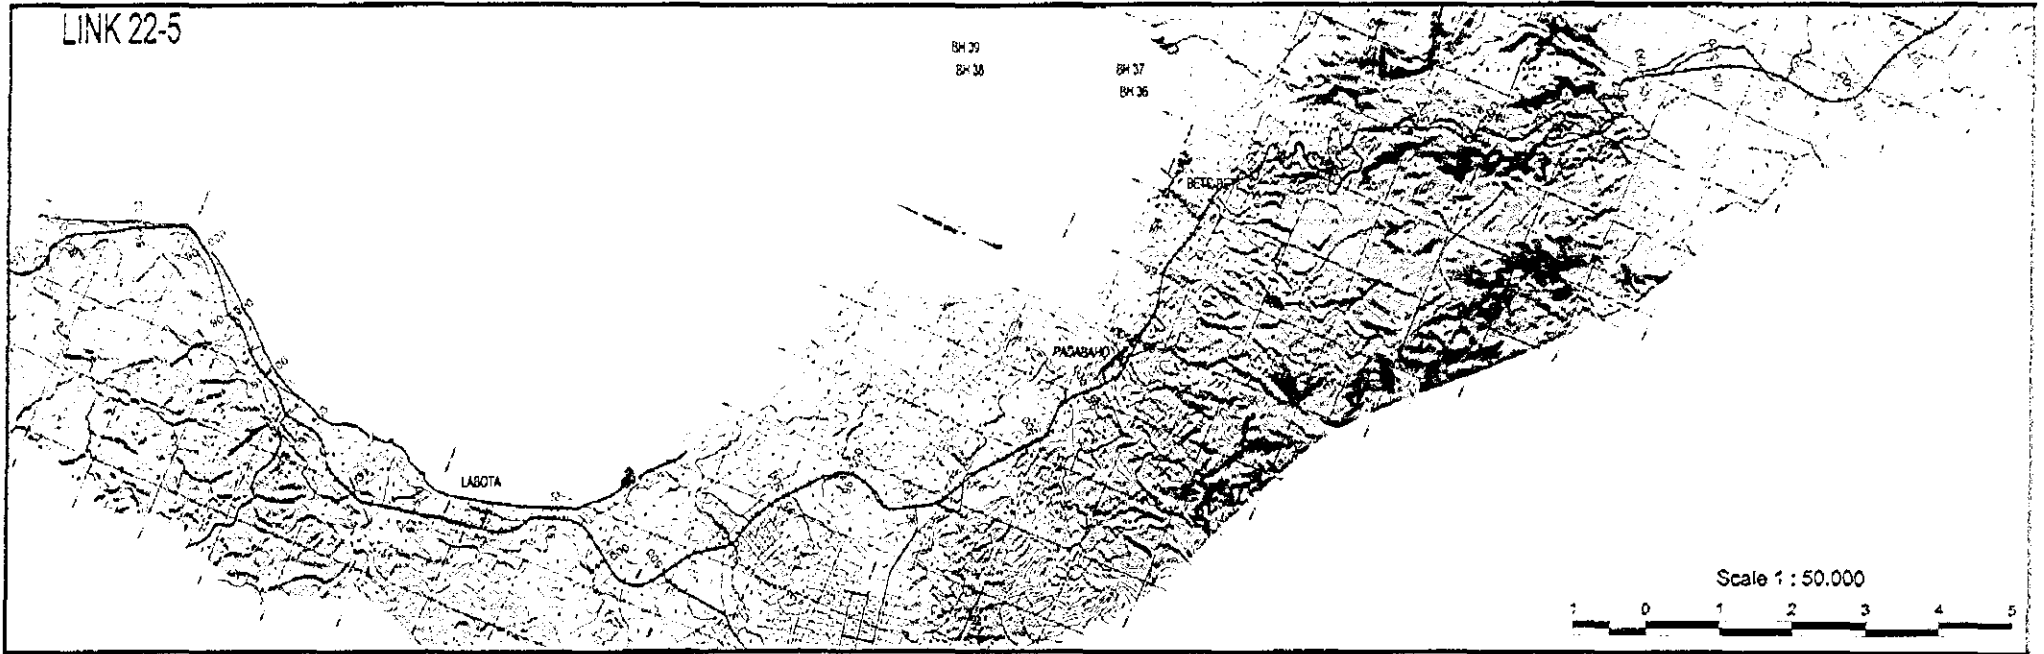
Road Alignment of Umpanga to Sandangpangan (4 of 11)
